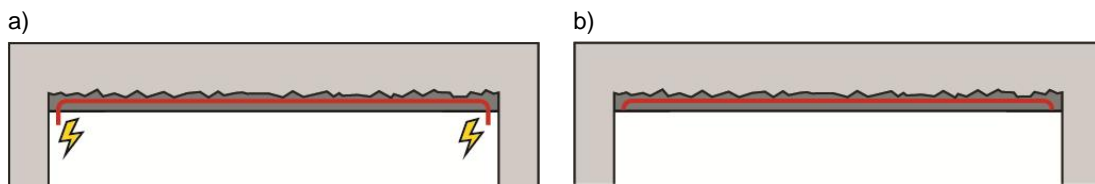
a) Electrical heating, prestressing over the entire length, b) cut-off end hooks
